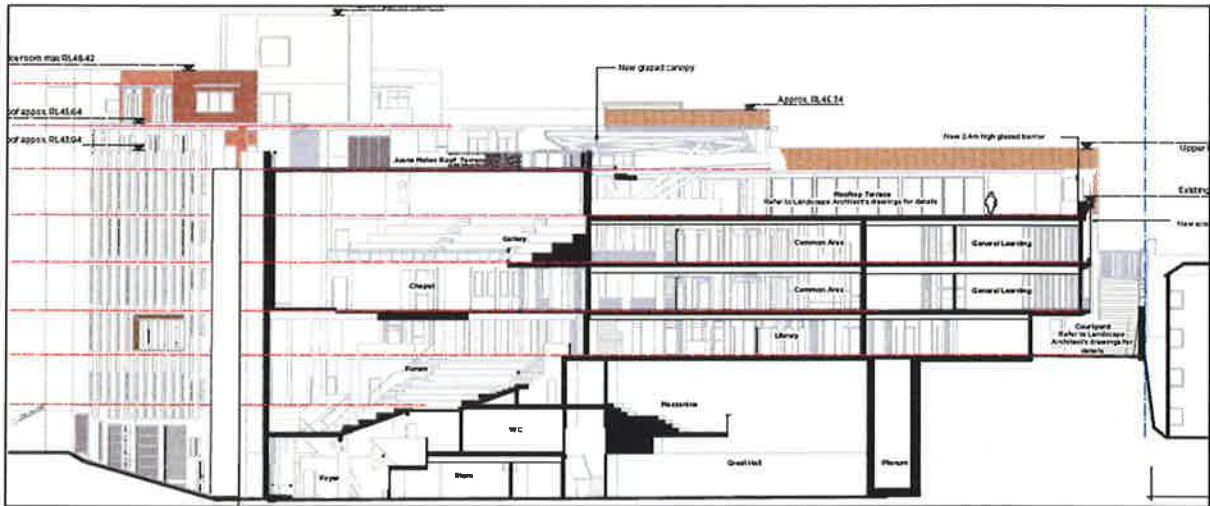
| Main Campus – Proposed Section looking northward (Source: Applicant’s EIS 2018)
